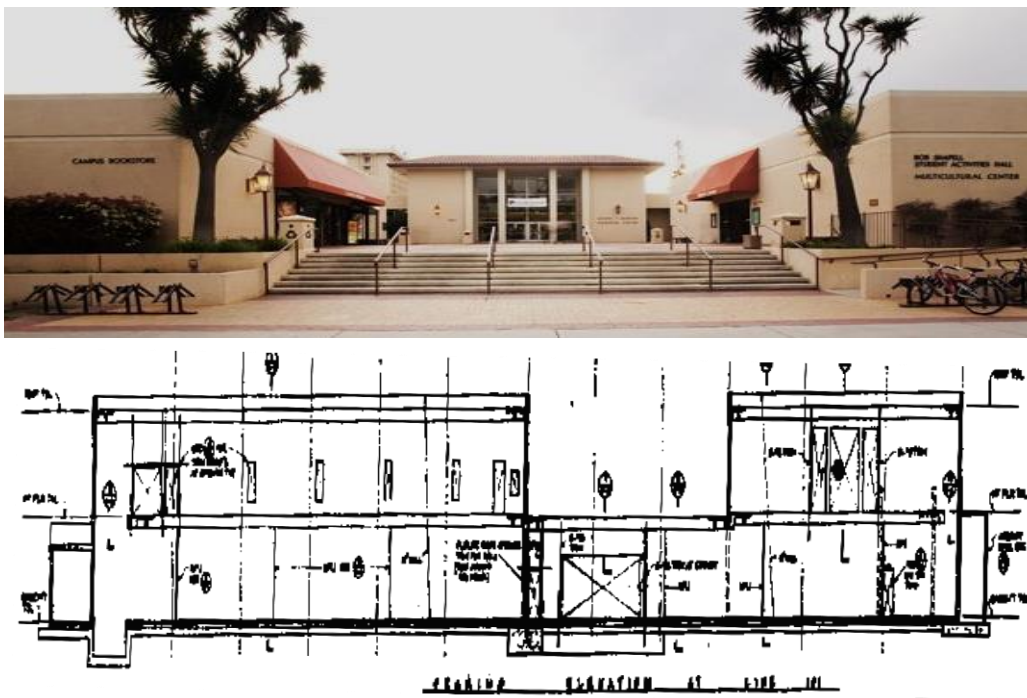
A comparison of the Benson Plaza with its framing elevation view.
